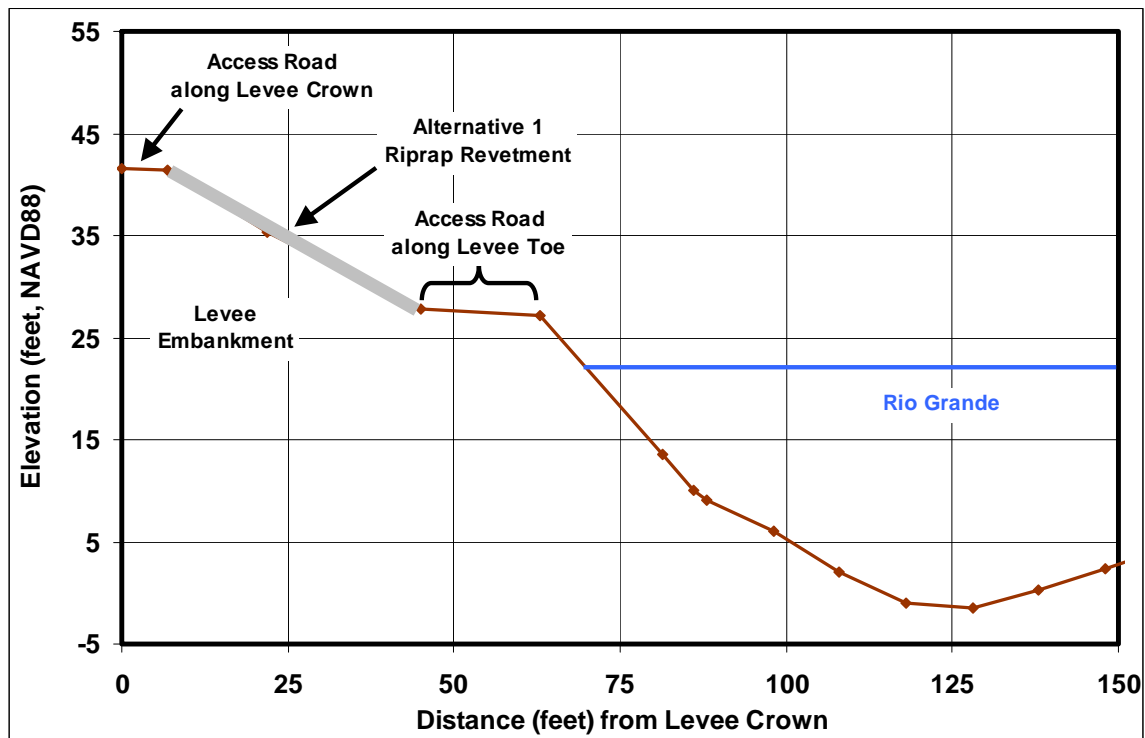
Alternative 1 Embankment Protection – Riprap Revetment on Upper Bank Only
